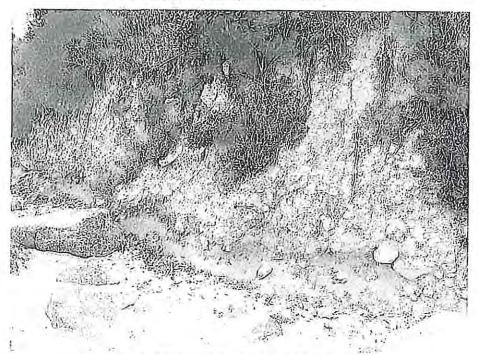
Rip-rap slope protection, bluff area west of project site, viewed to northeast.
